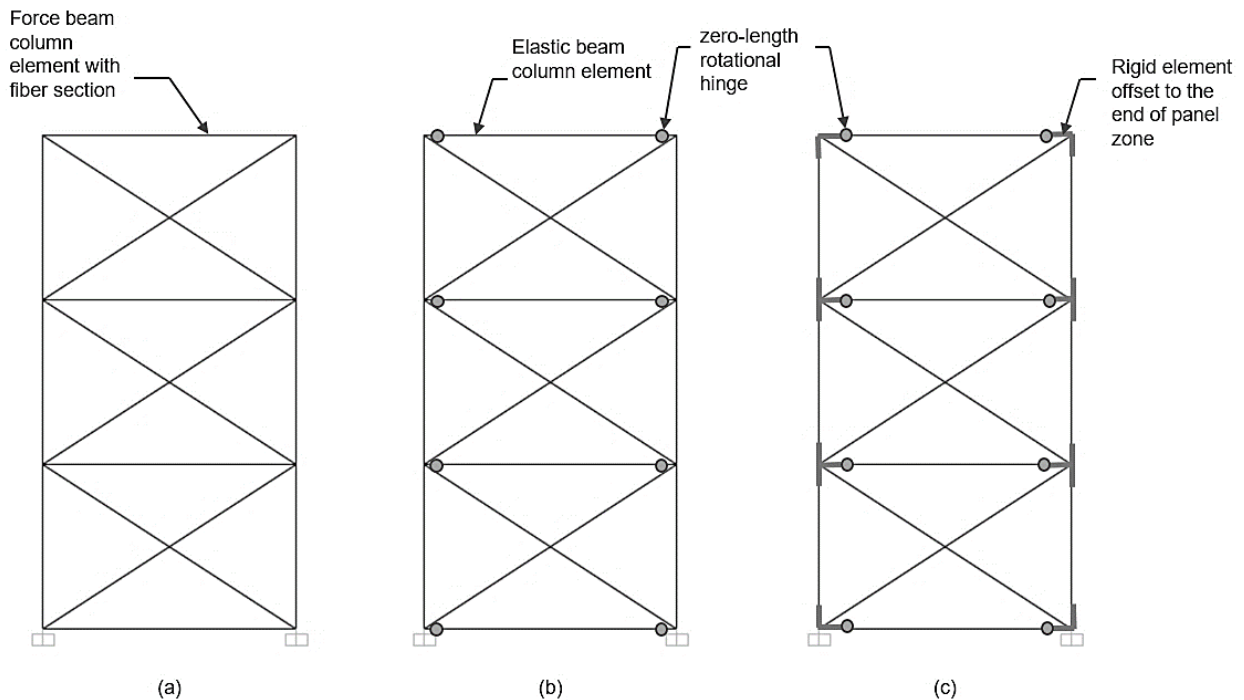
Different models for the moment frame surrounding the infill wall (leaning column not shown for clarity)
